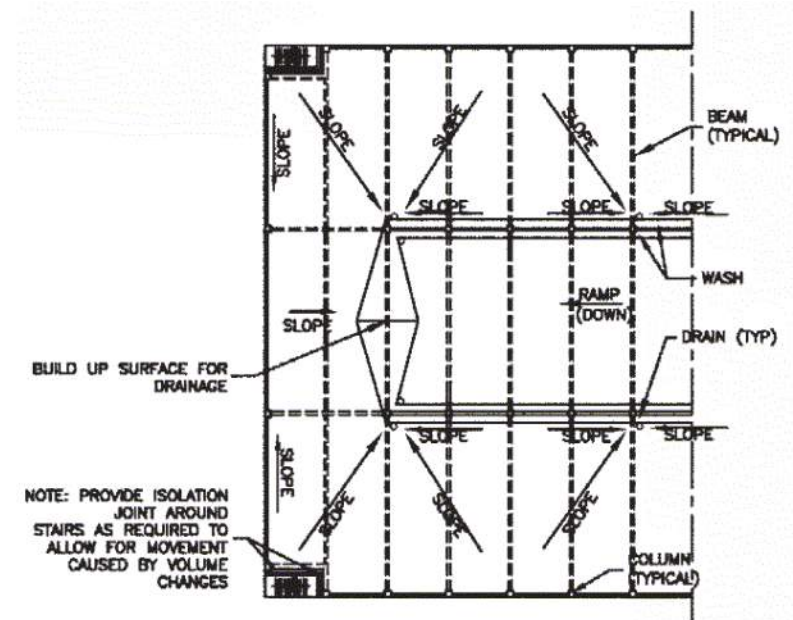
Schematic of post-tensioned one-way slab and beams system.
